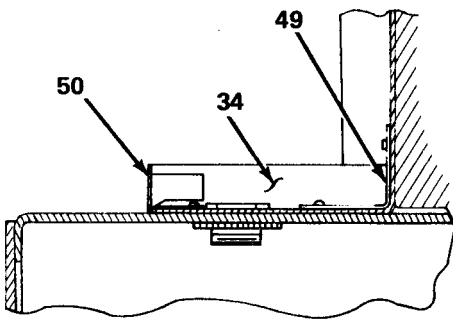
Electrical Equipment Shelter Utilities Raceway Installation (Sheet 5 of 6)
